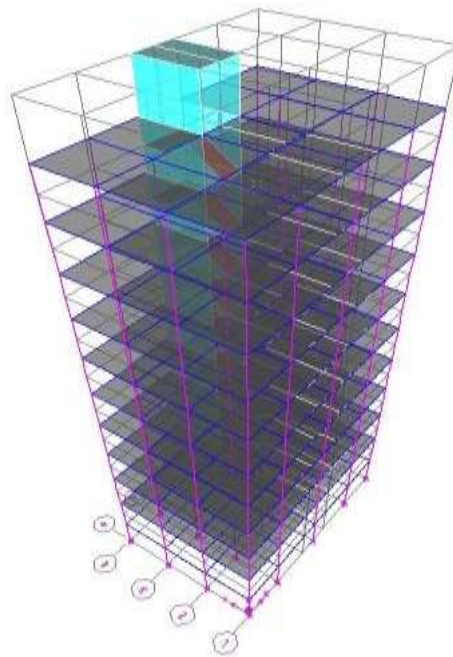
3D Model of a 10 storied building (Fixed supported)
